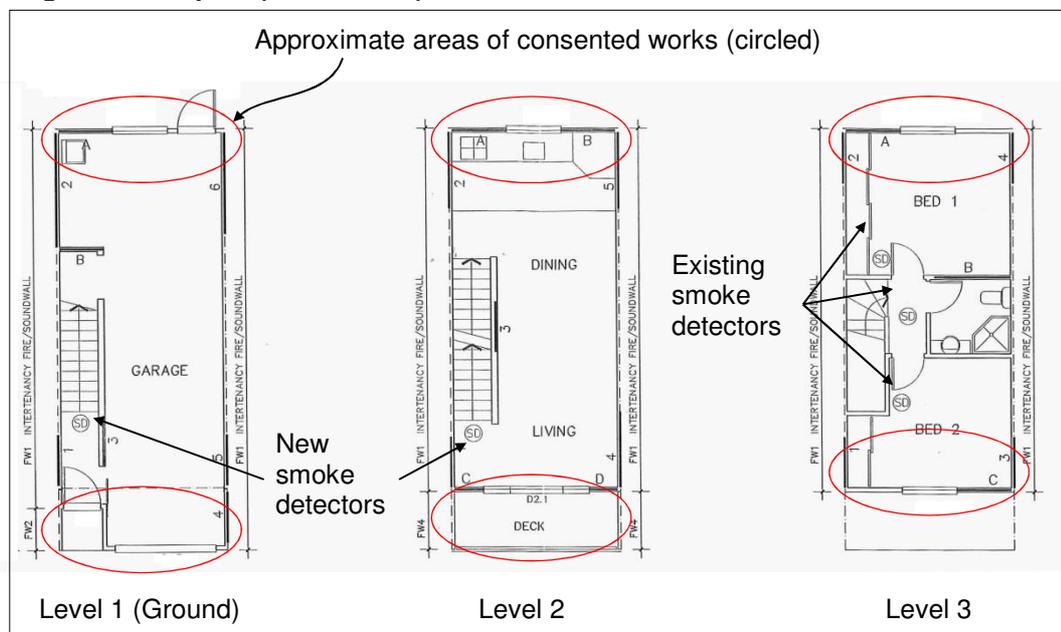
Floor plans unit type A (Taken from bracing plans. Not to scale)
